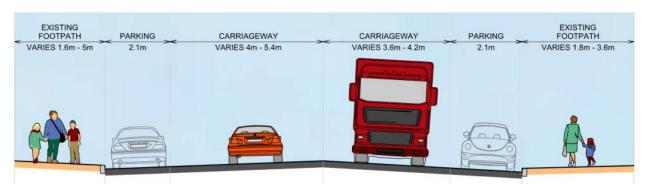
Typical Section 5 Do Nothing Scenario Henry St
